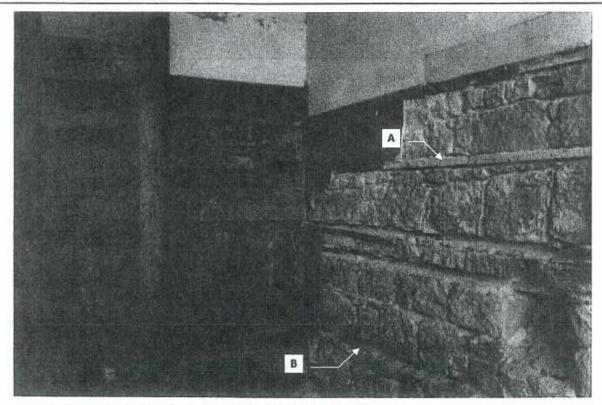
Room 1 view northeast. (A) Wood nailer, (B) Floor joist pockets.
